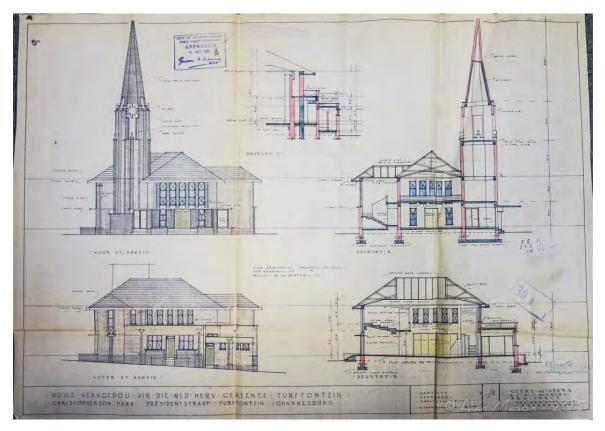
Original for the NDK front façade facing President Street (Source: City Council of Johannesburg, Plans Archive)
